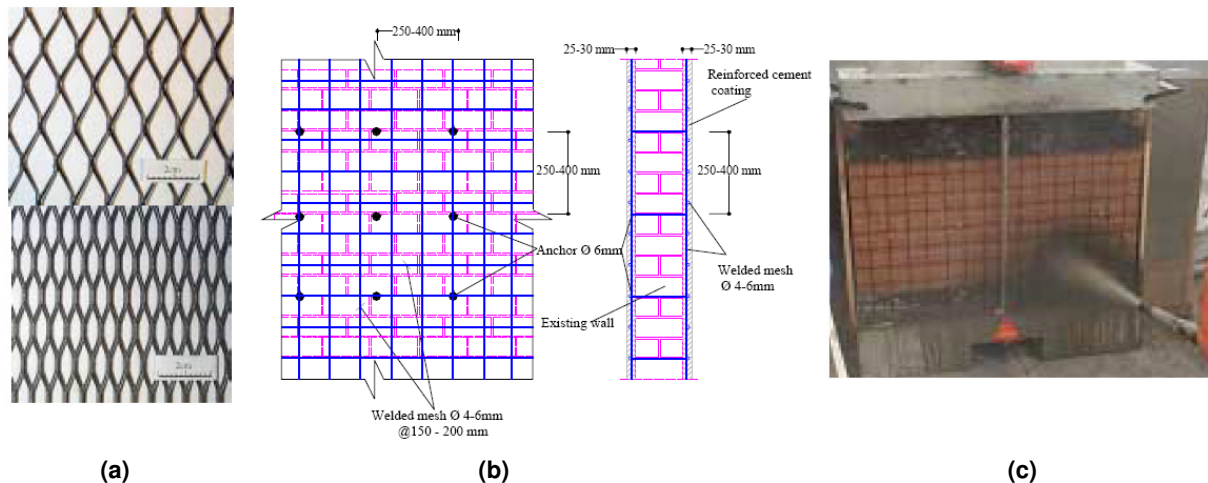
Surface treatments: samples of reinforcement used in ferrocement (a); typical layout of reinforced plaster (b); application of shotcrete (c) [1].
